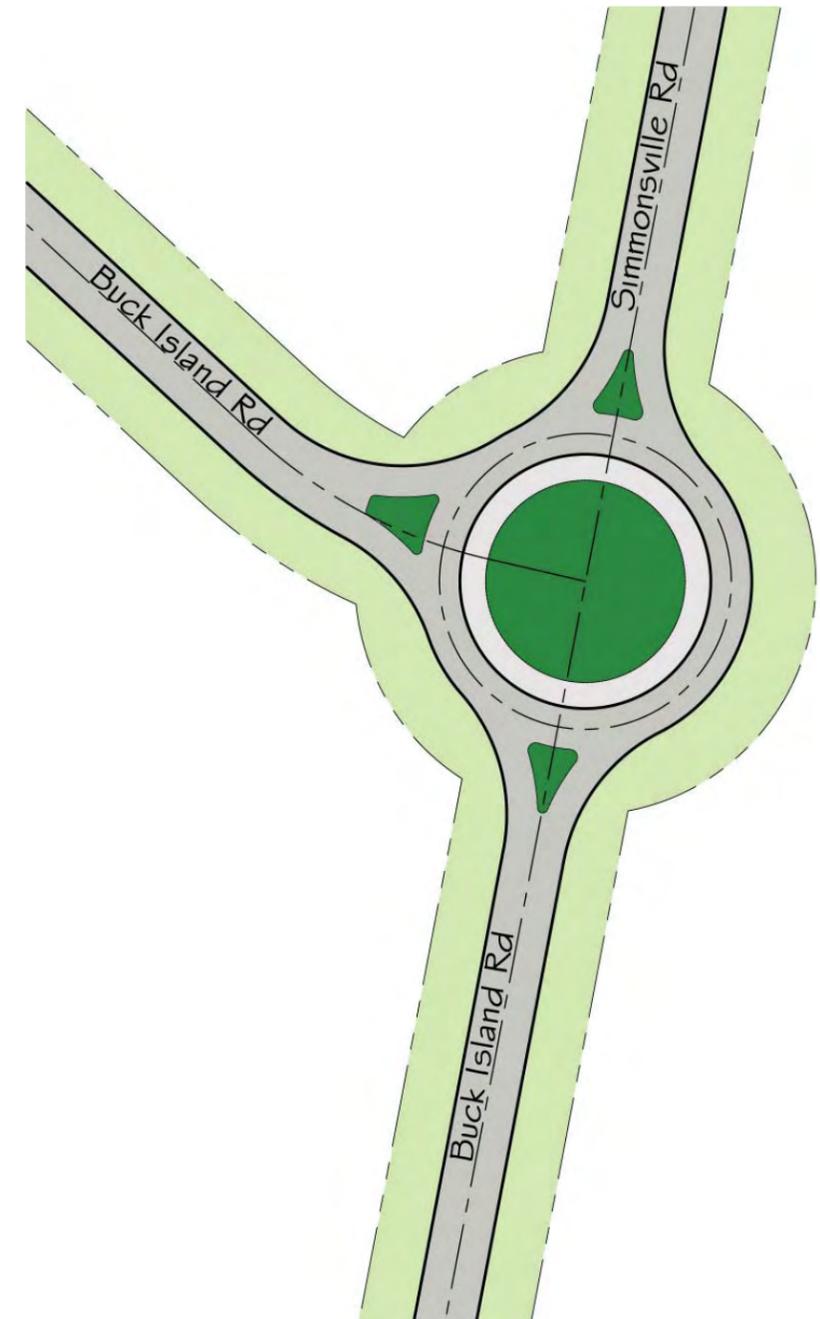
Conceptual roundabout at the Buck Island Road/ Simmonsville Road intersection.
